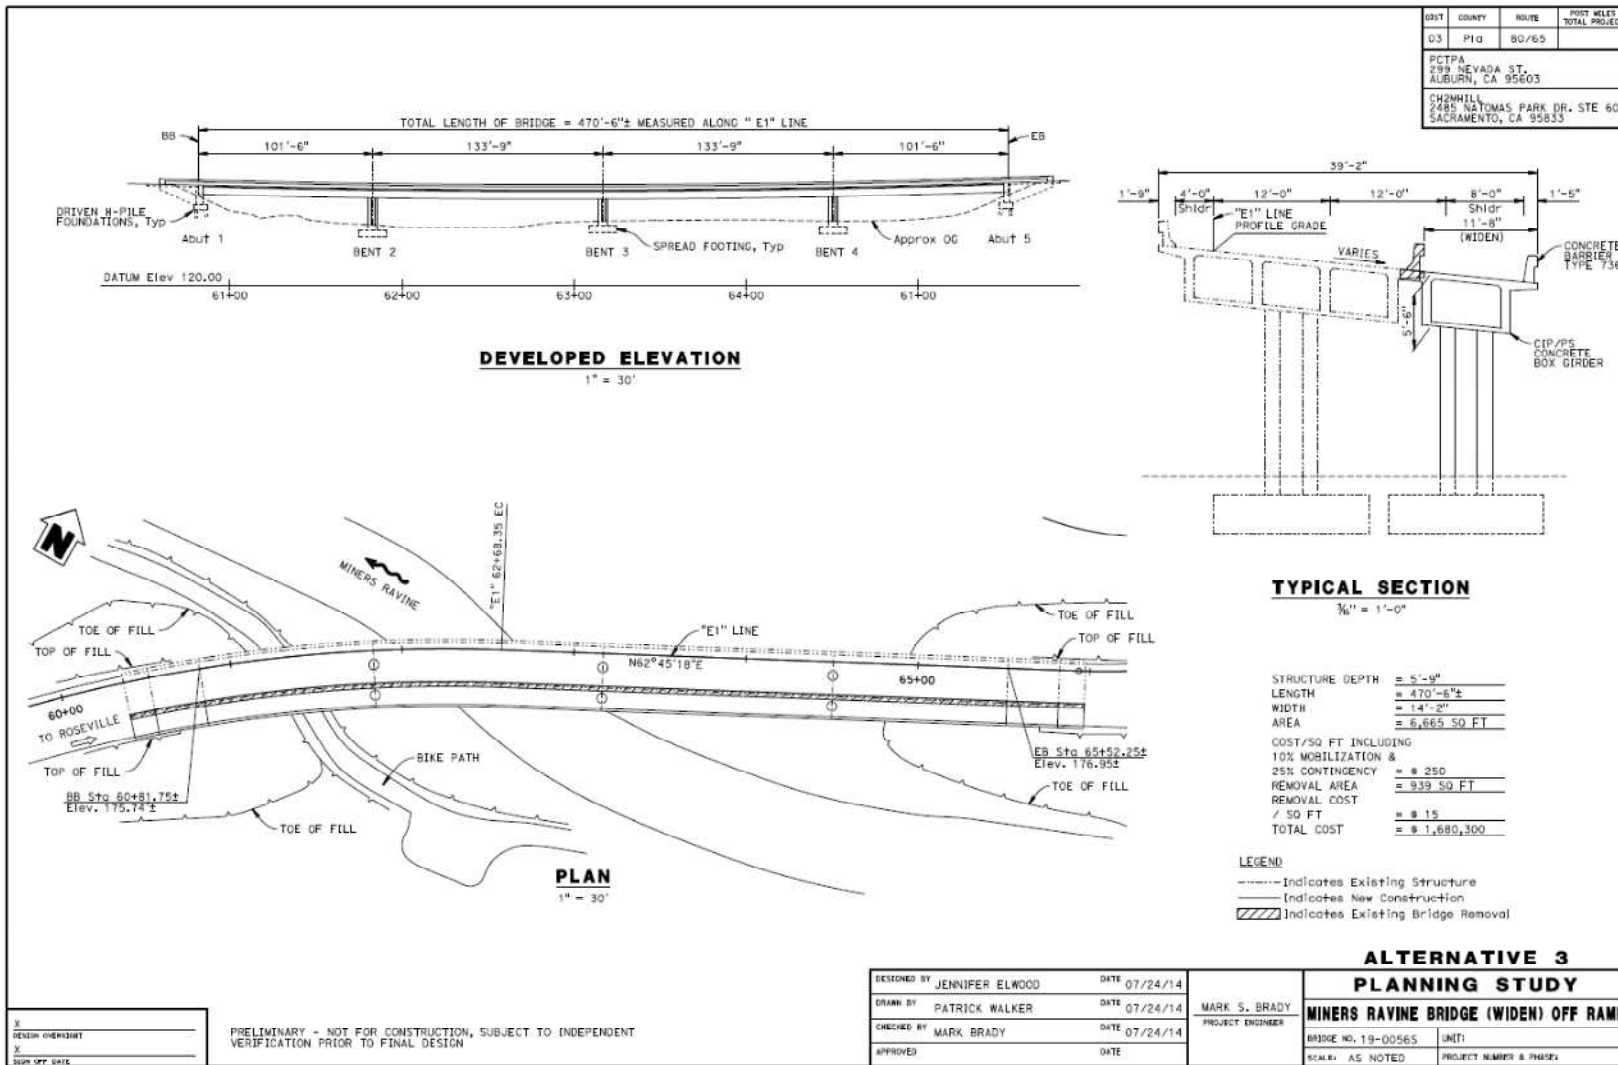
Proposed Miners Ravine (Widen) Off-Ramp to Eureka Road Bridge Planning Study (Alternative 3)
